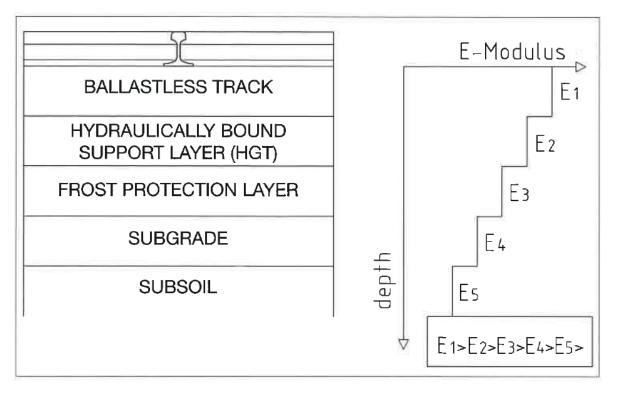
Layered construction and stiffness for slab track (Frühauf et al., 2006)
